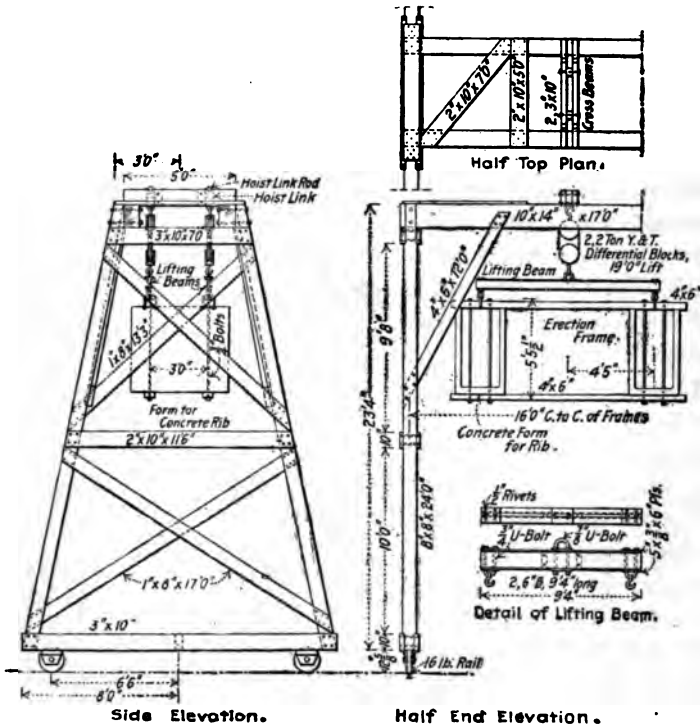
Traveler for Erecting Arch Ribs, Belvidere Bridge.
